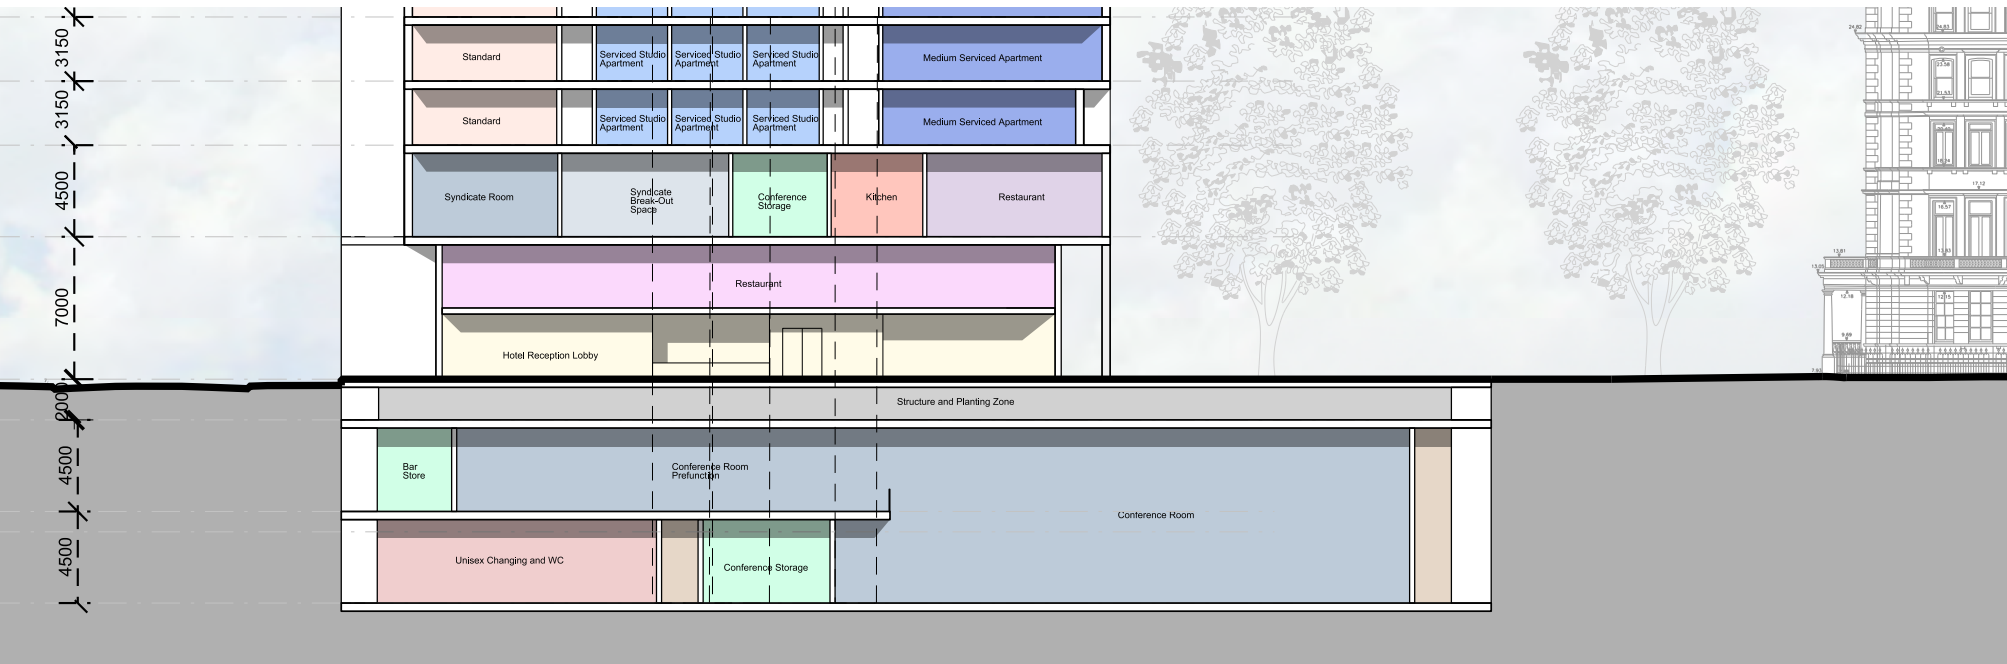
Cross section through the lower levels of the building illustrating the functional connections for the front and back of house for the hotel
